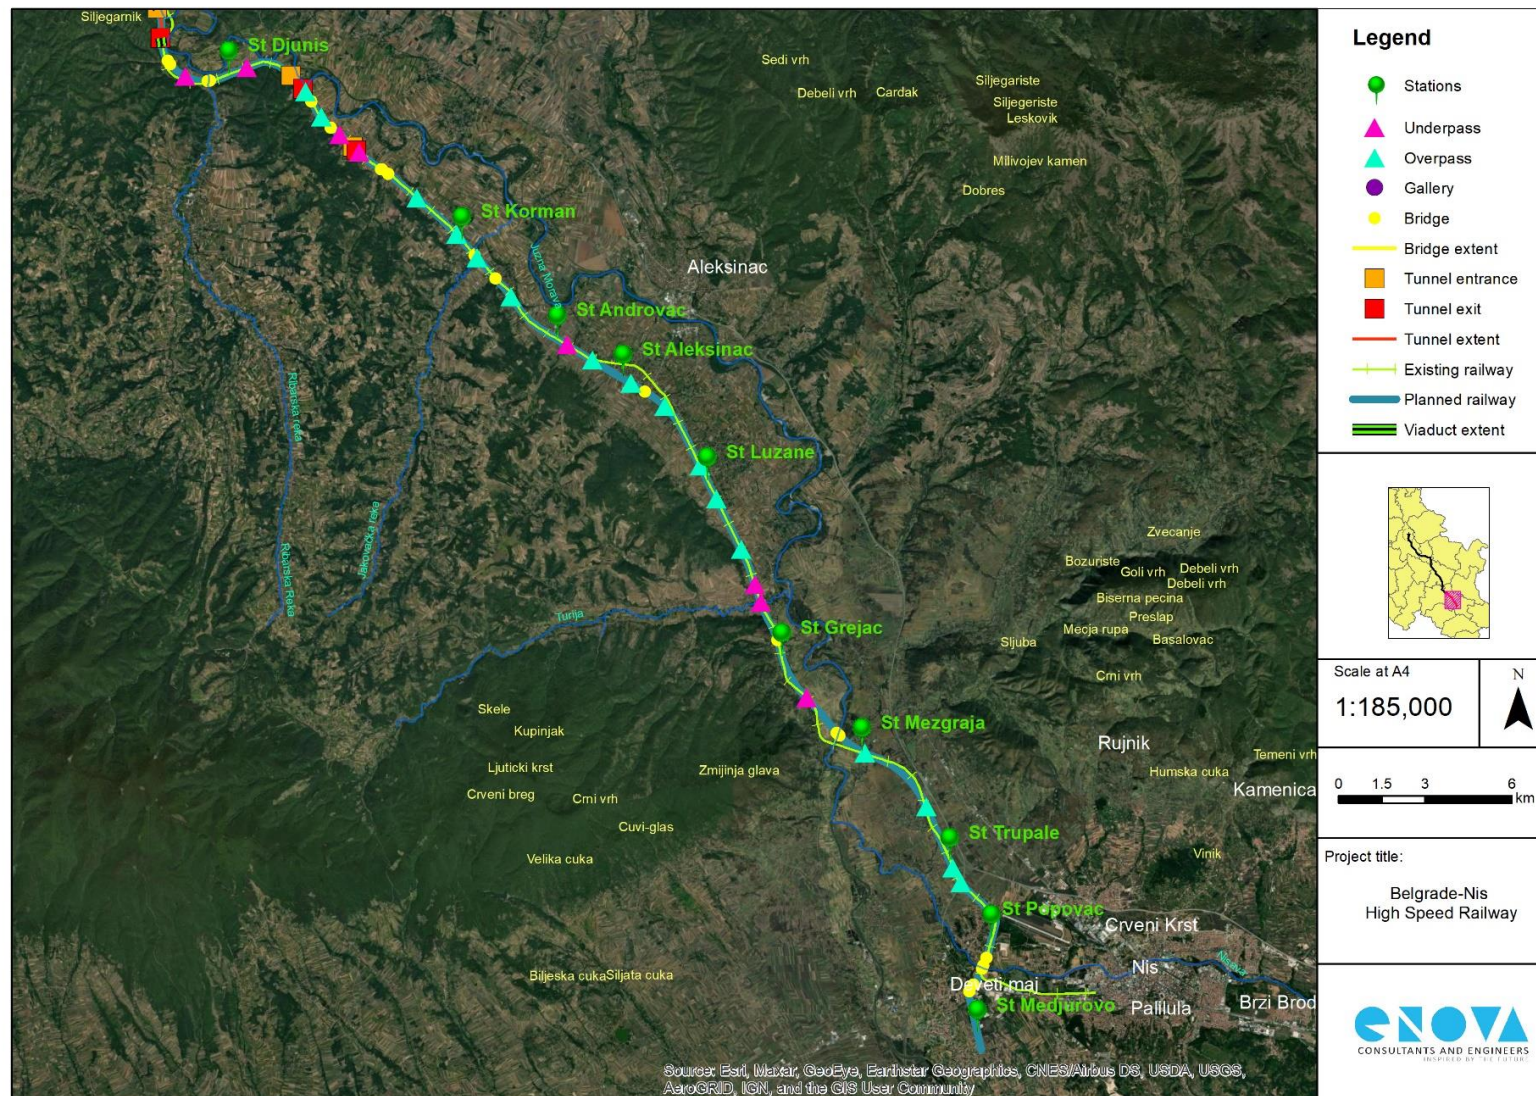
Existing and planned railway with ancillary structures (Djunis-Medjurovo subsection)
